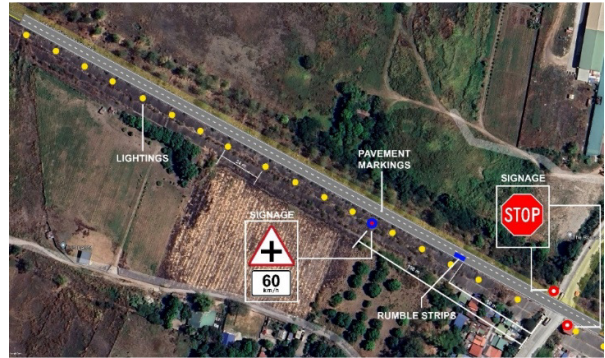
2-Dimensional Layout Plan of Proposed Countermeasure for 3rd Black Spot Priority (Segment 12: K6+295 - K6+795)
